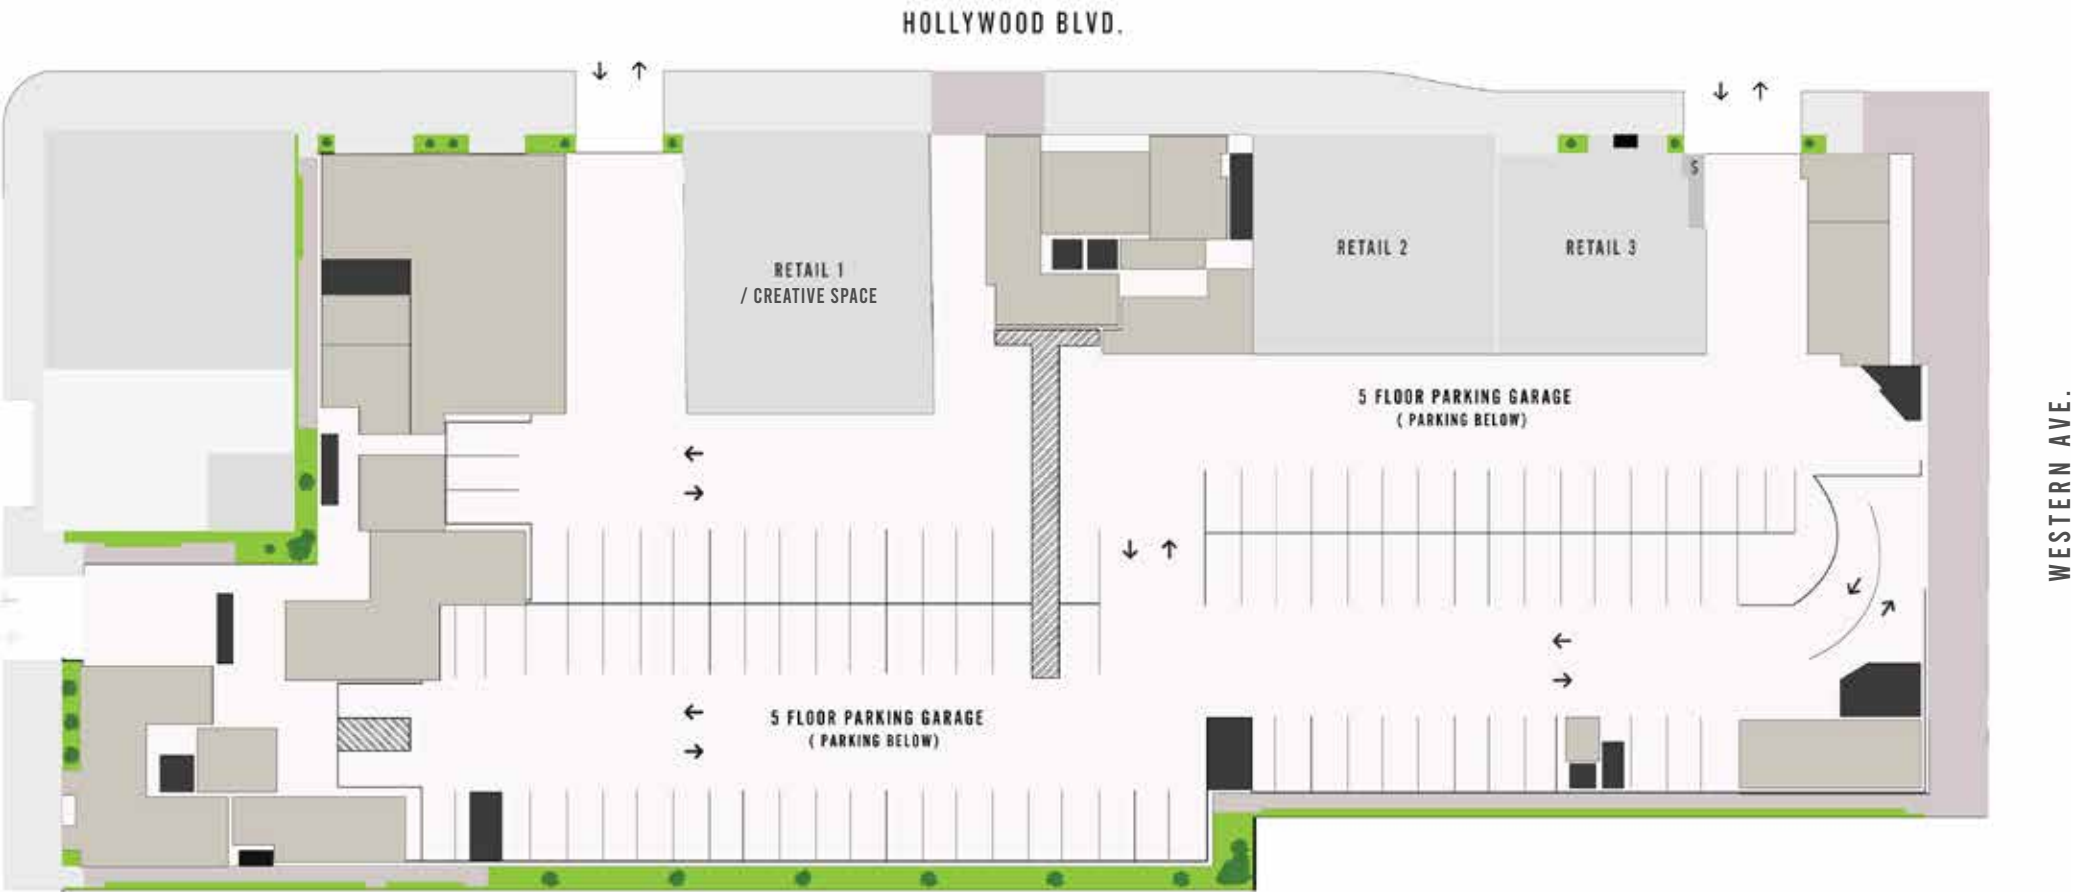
# EXHIBIT AREA RETAIL/HOTEL OVERVIEW
